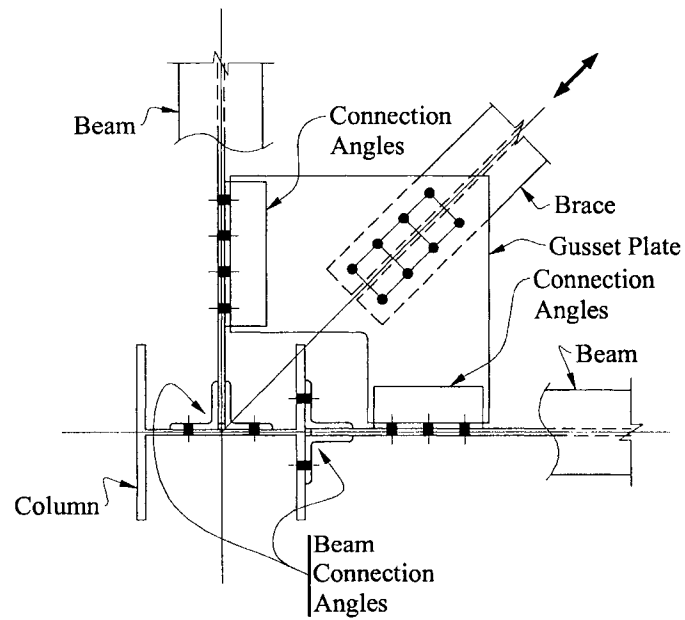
Horizontal brace connection at beam-to-column intersection.
